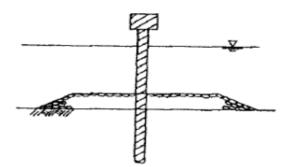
Curtain wall breakwater (D'Angremond et.al., 2008)
